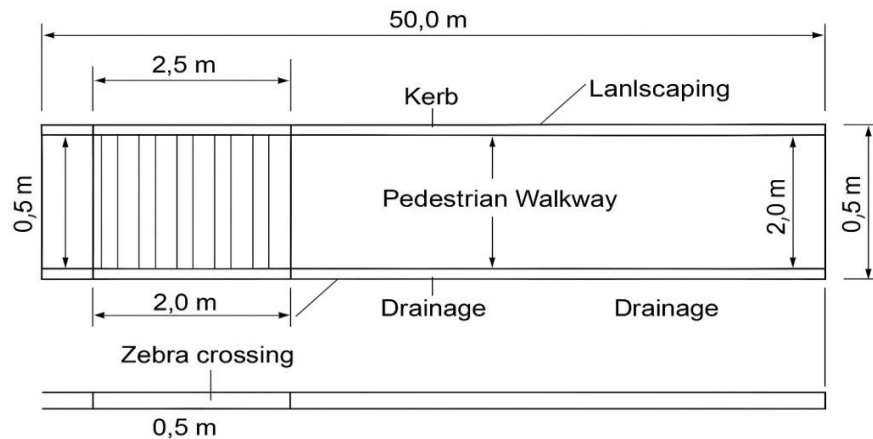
Plan view of proposed walkway (50.0 m × 2.5 m, with drains and landscaping)
